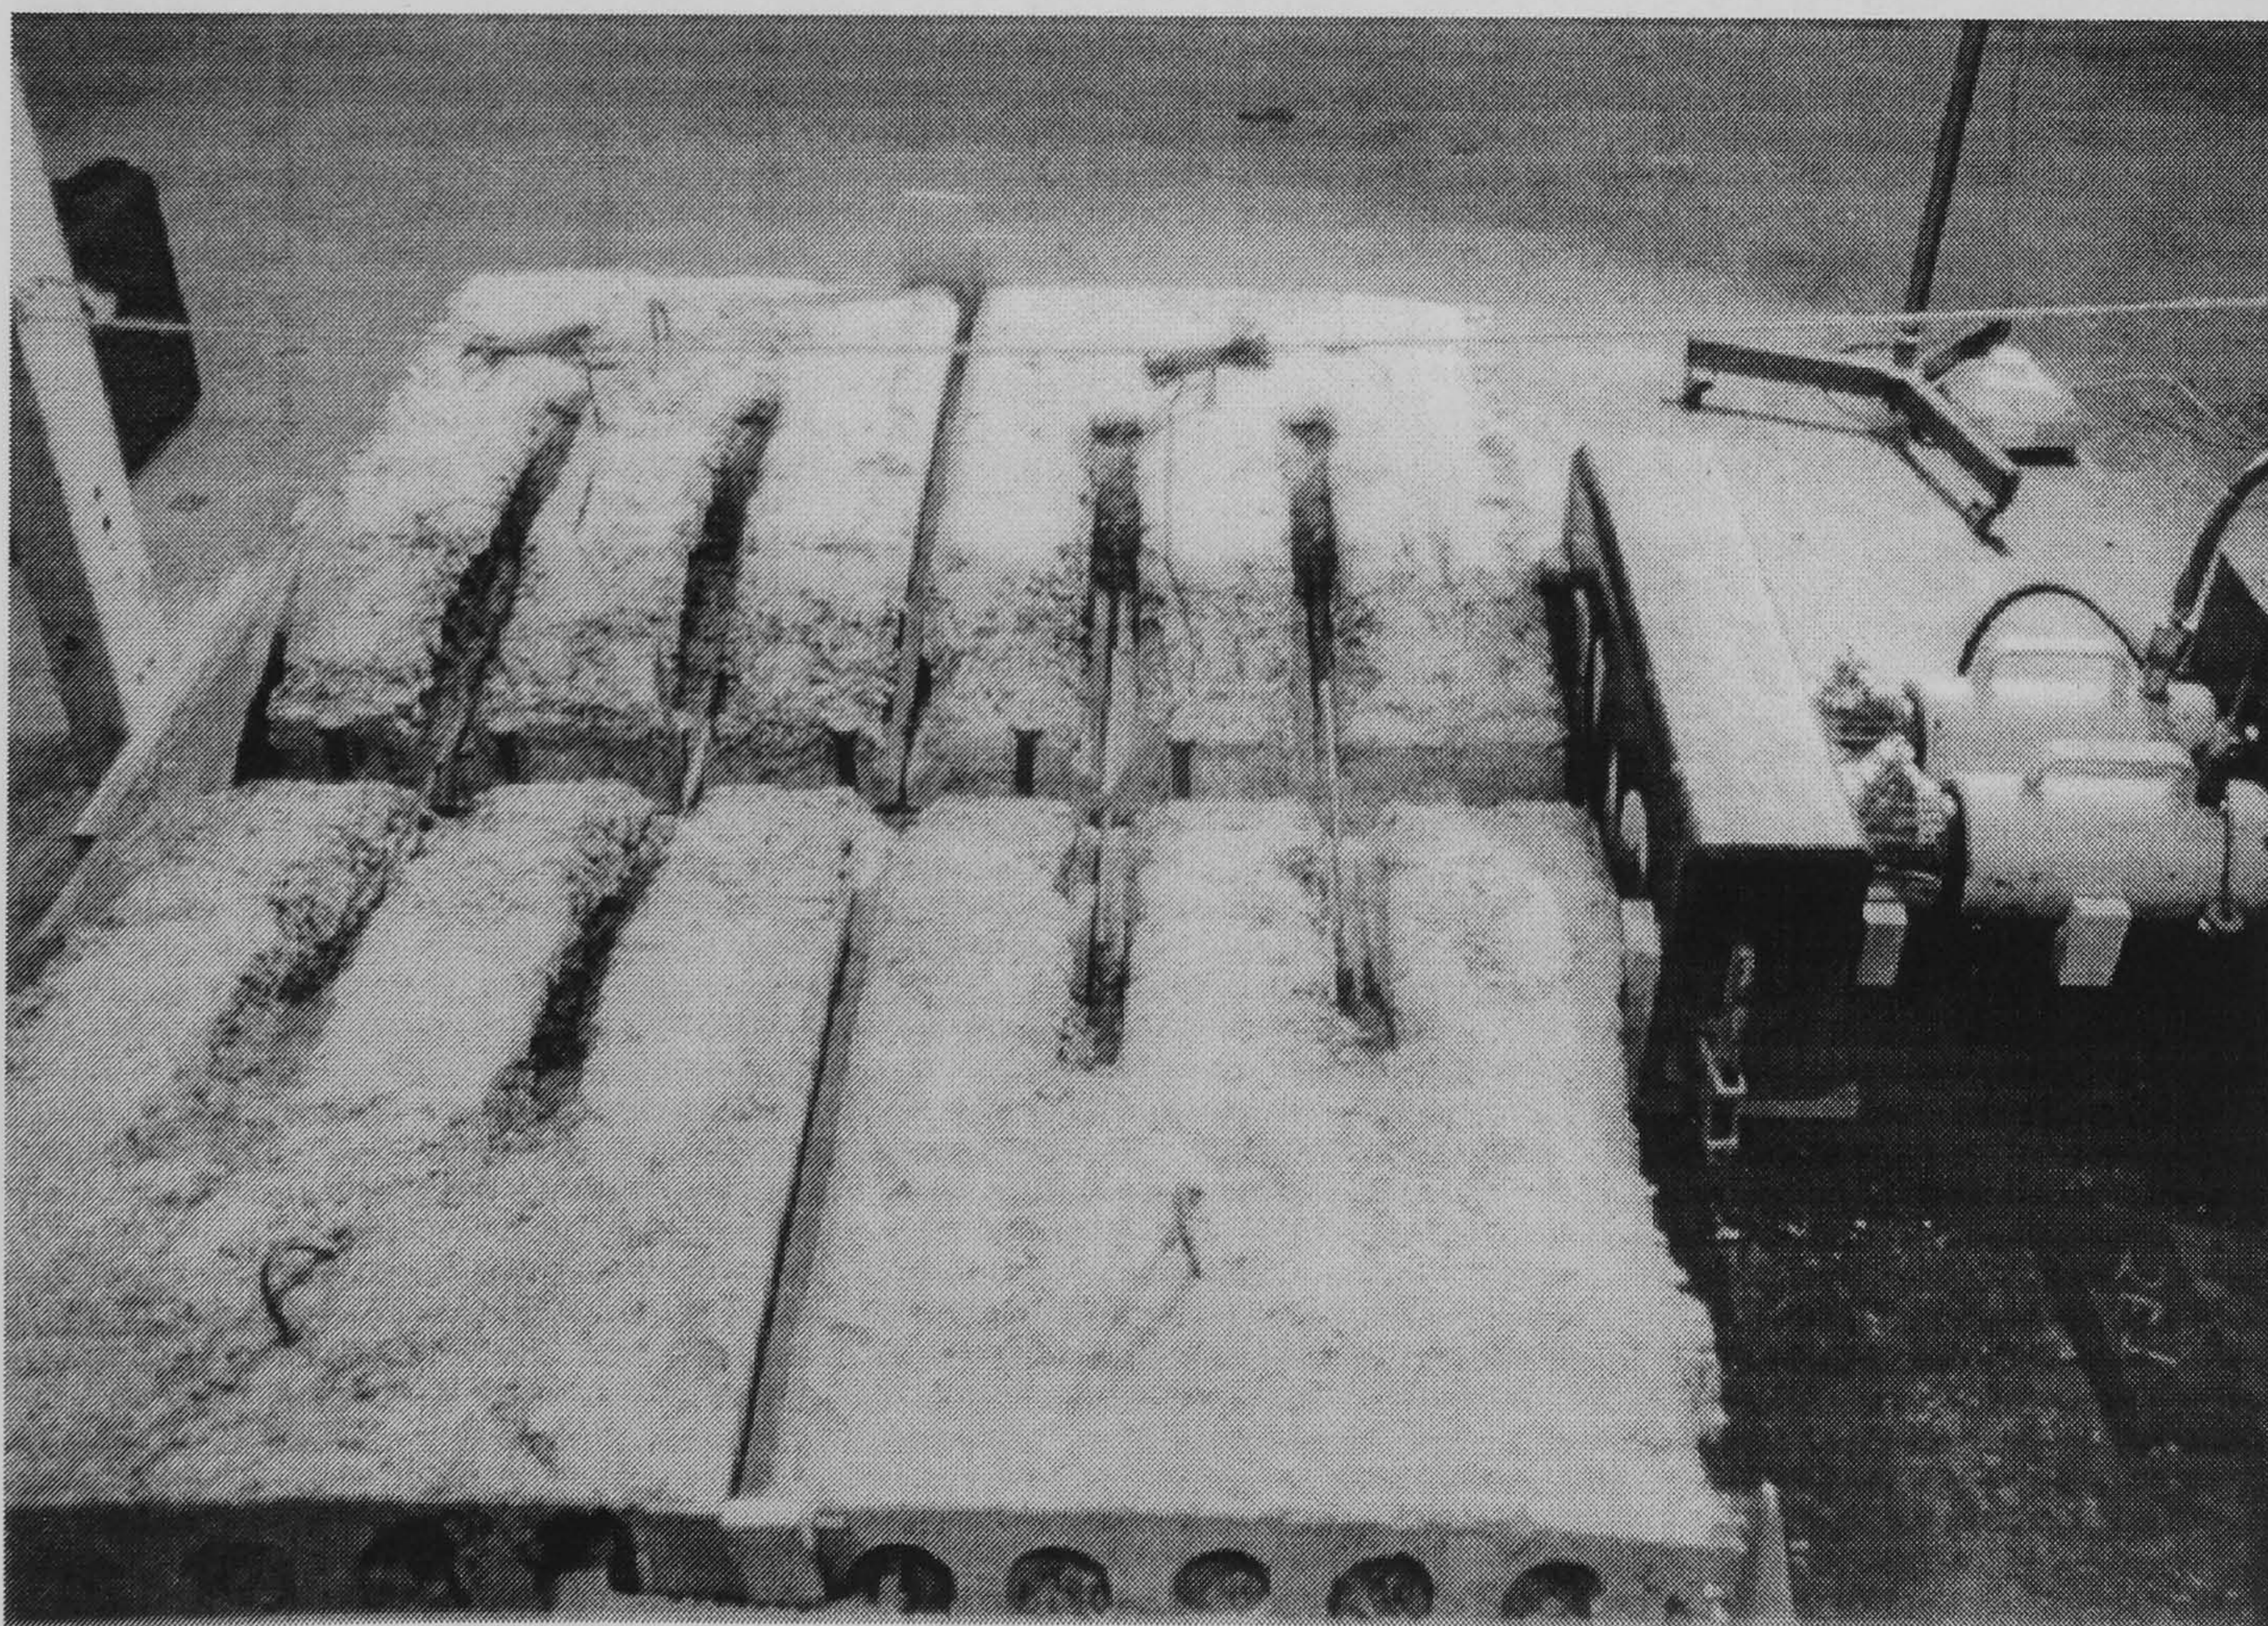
Push-off test specimen before insitu infill concrete.
